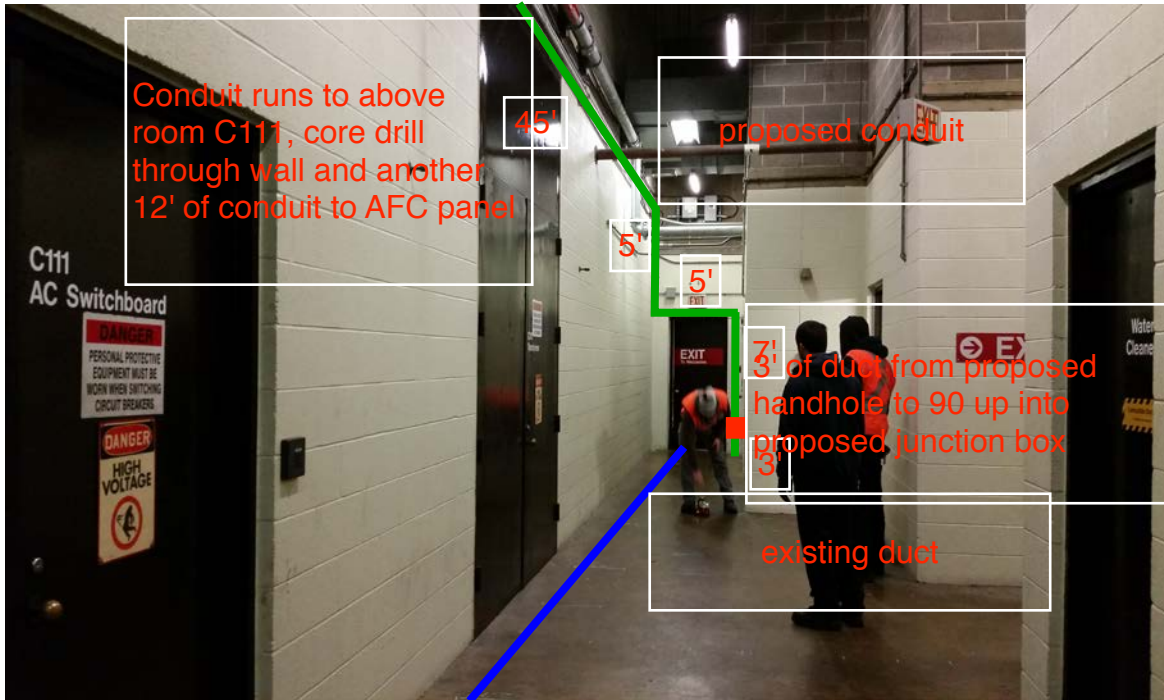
C12 Braddock Road: Existing duct from kiosk to existing handhole 1.
